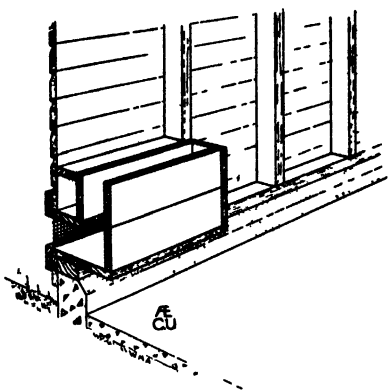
Built-in intake. Built-in intakes should extend entirely inside the frame. Inlets of this type may have a wire netting guard to prevent the birds from roosting on them. No inlet should be within 8 feet of the outlet flue. (Courtesy of Agr. Eng. Dept., Cornell University.)
